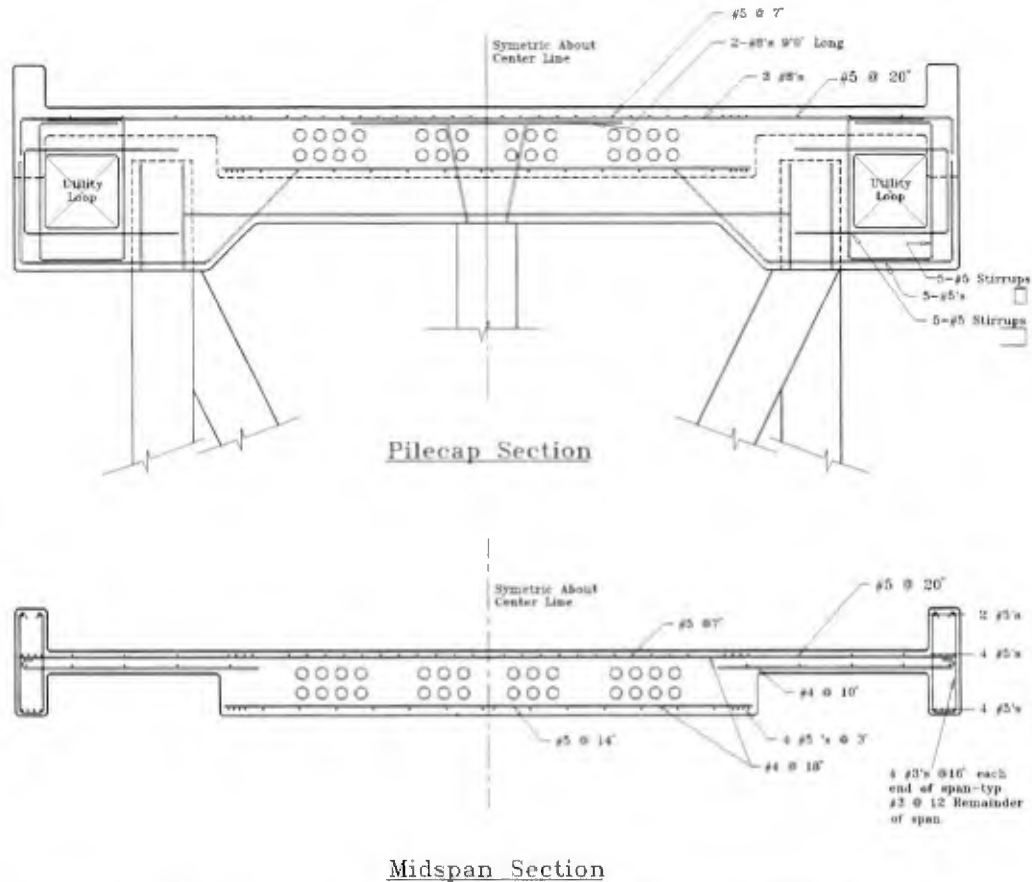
Cross-sections through the pilecap (top) and deck of Pier 12 showing reinforcing steel.
